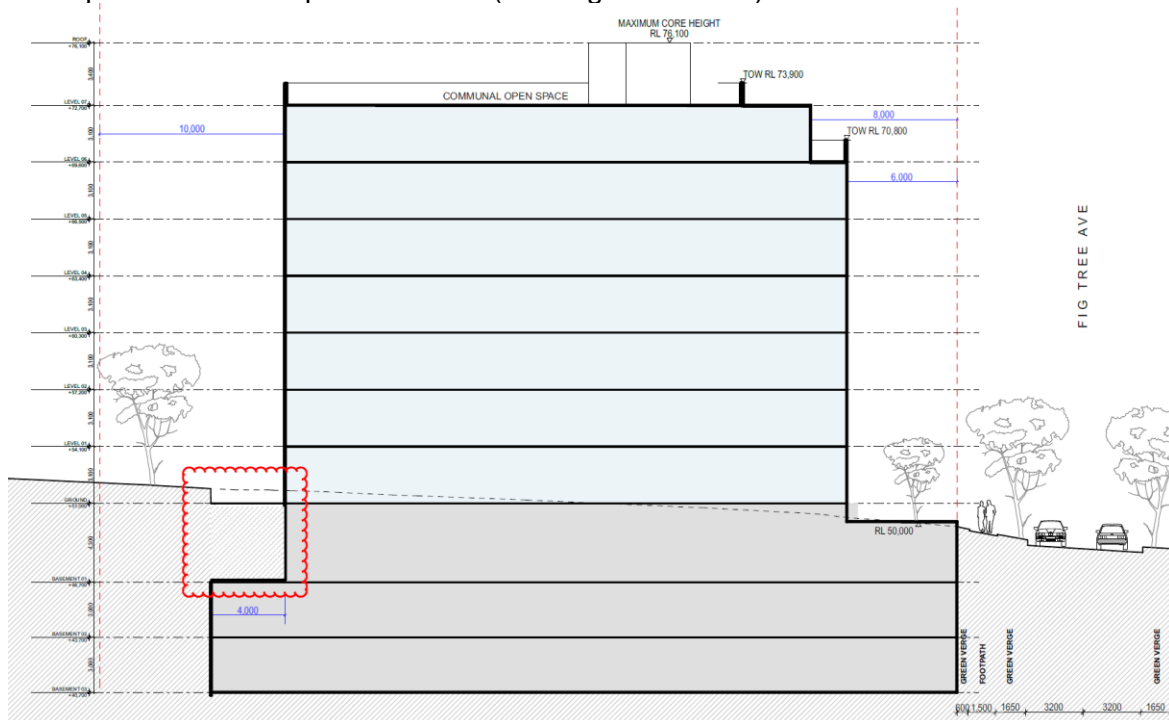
Section (front to rear) demonstrating first floor basement set-in.
